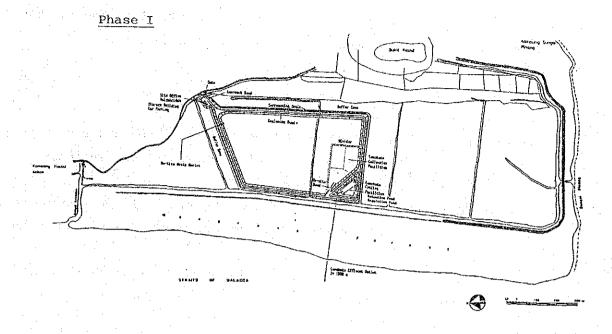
Stage Plan of Final Disposal for MPPP
